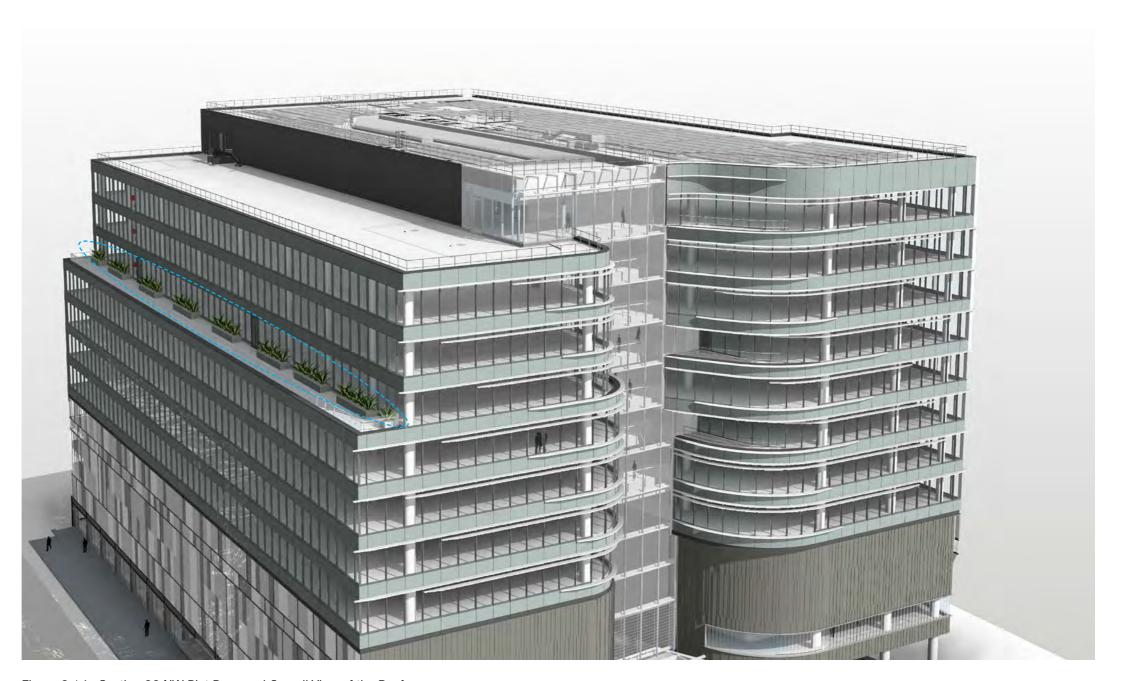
Section 96 NW Plot Proposed Overall View of the Roof
